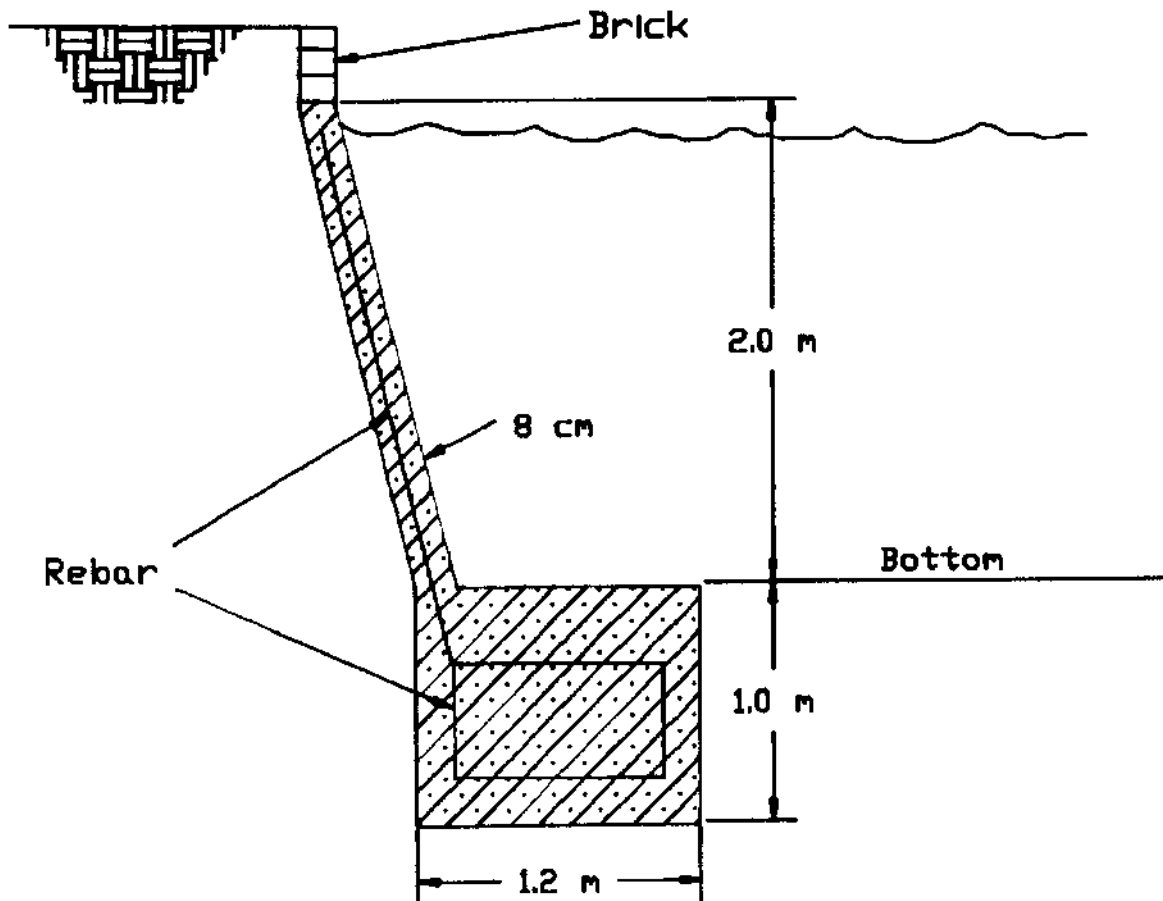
Cross-section of reinforced sloped concrete pond wall at farm 11.
